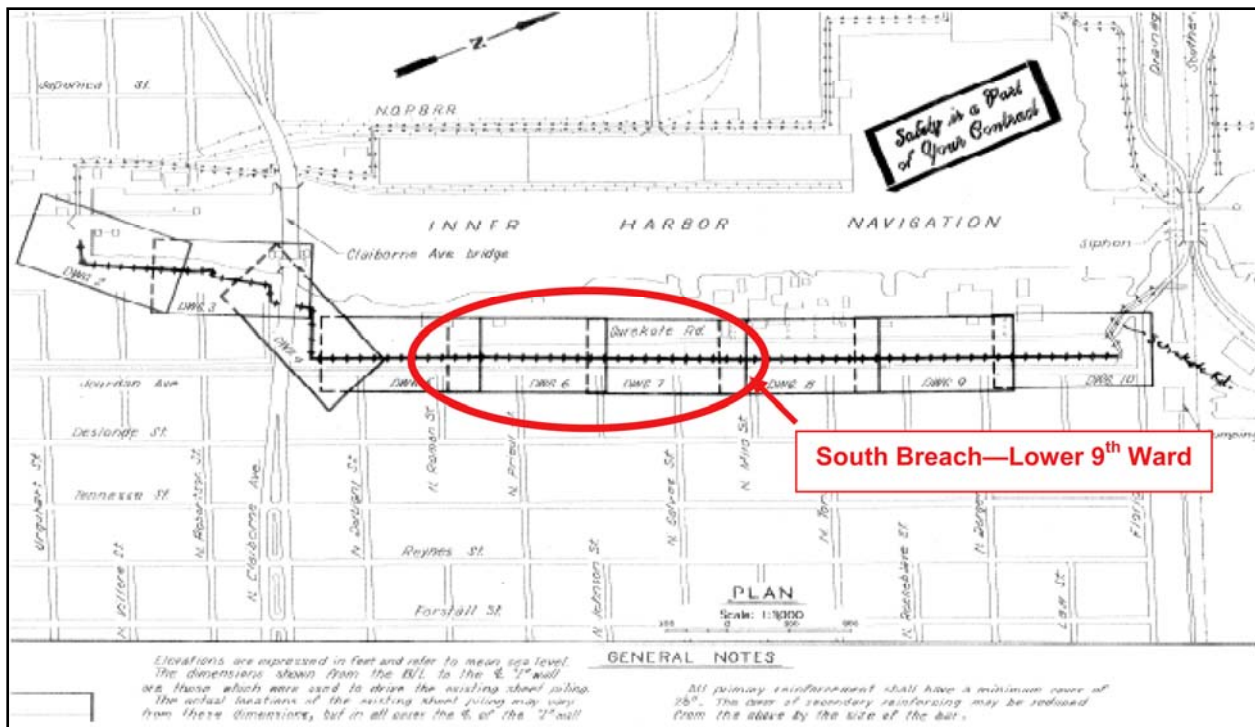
IHNC East Side Floodwall Capping—IHNC Lock North to Florida Avenue (Lower 9th Ward Breach at approximately Sta. 2+00)
